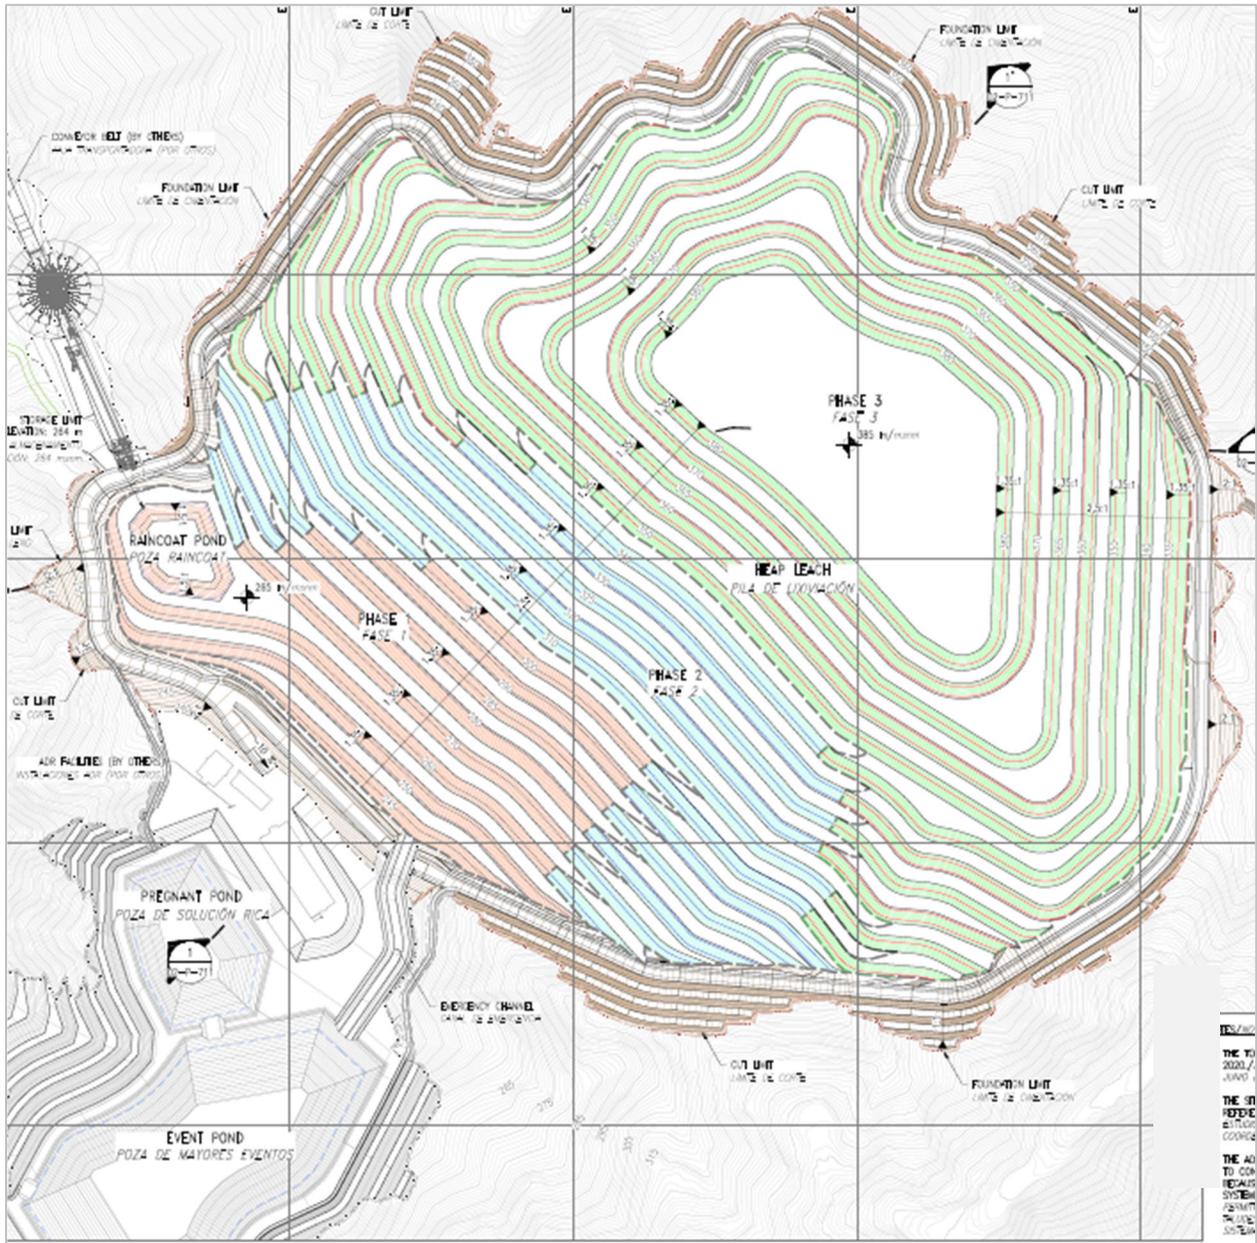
Maricela HLF - Plan View (AA, 2021)
